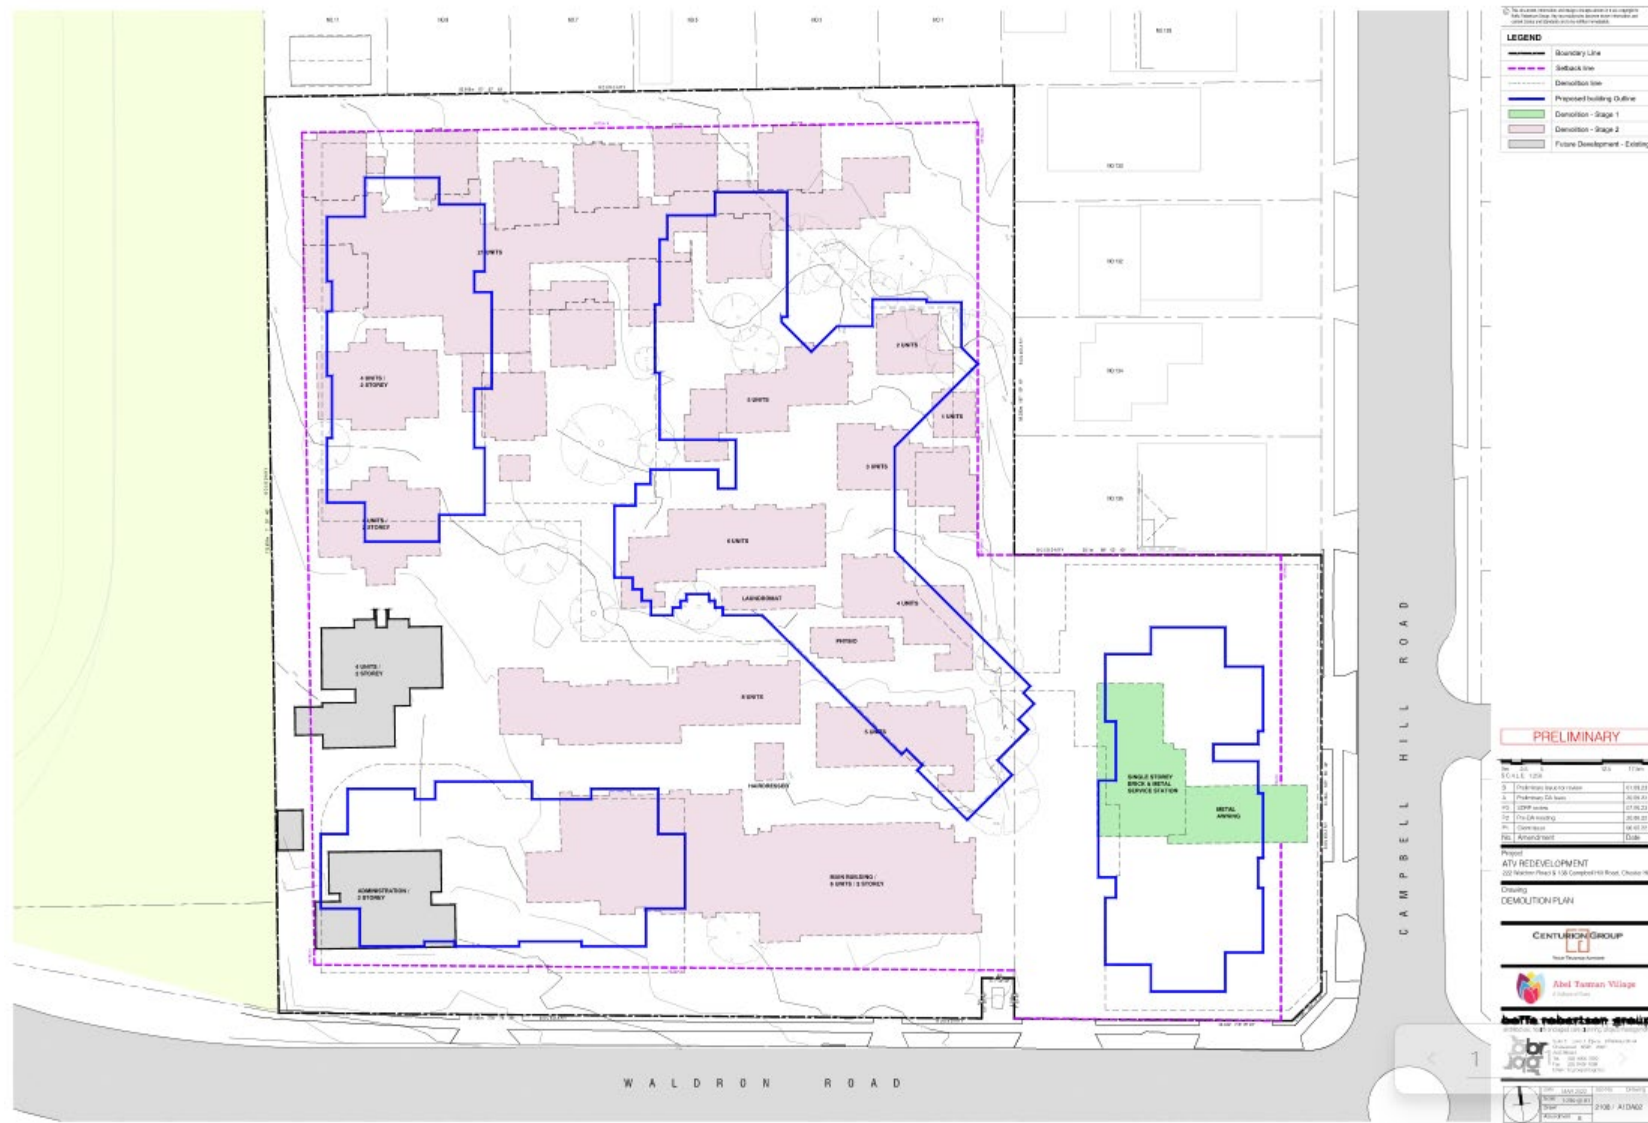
Proposed demolition plan (Boffa Roberston Group 2023)
